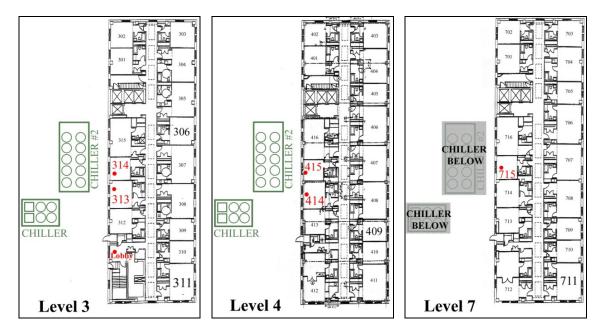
Floor plans of Levels 3, 4, and 7, with equipment and measurement locations.
